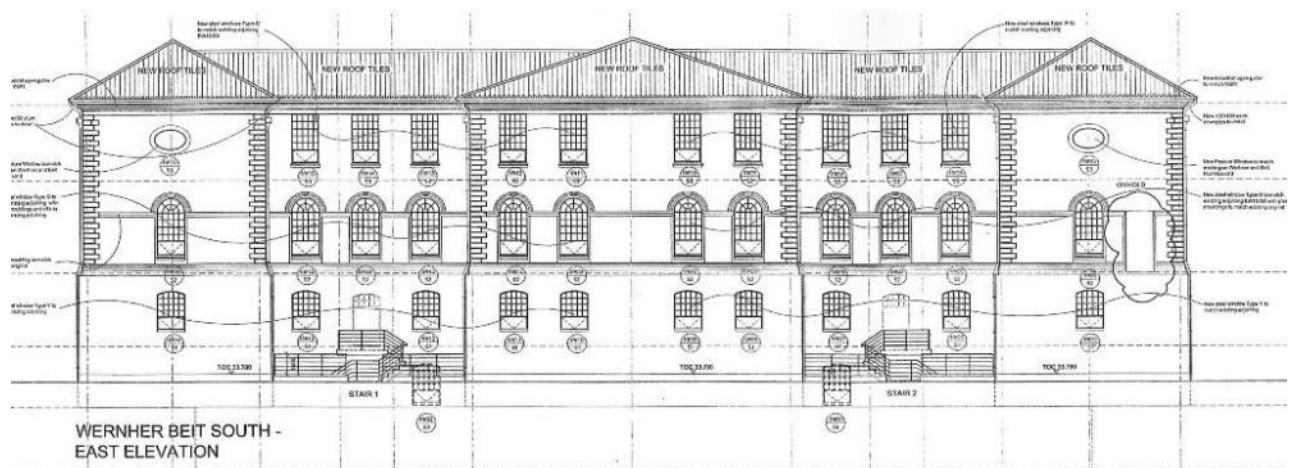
Detail drawing MLH/ GT Fagan - W&B South, Falmouth Road elevation
